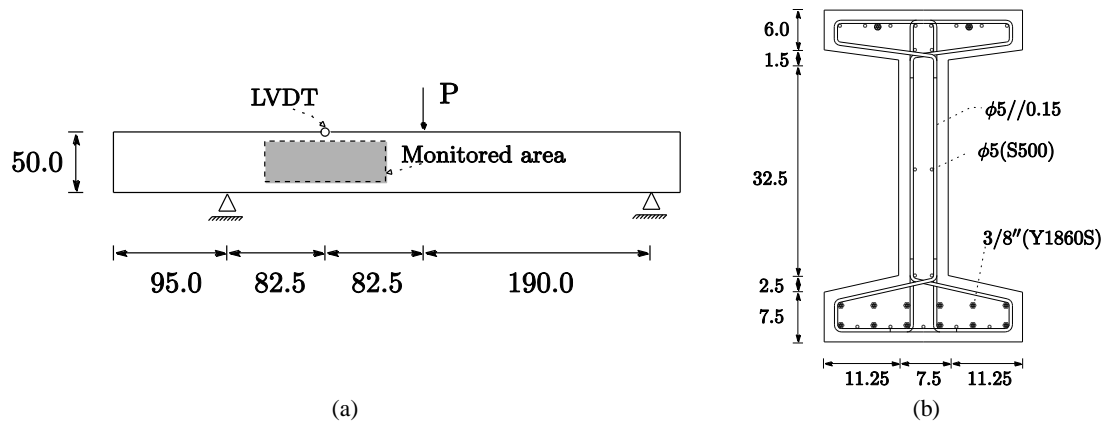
Prestressed HSC beam: structural scheme, load and boundary conditions; and (b) cross-section (dimensions in cm)
